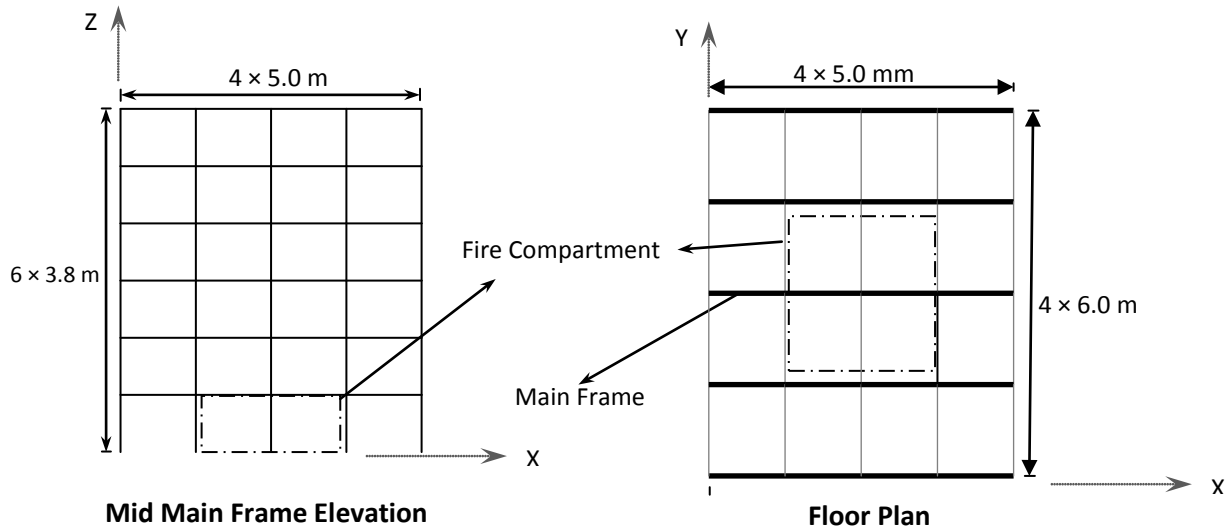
The Elevation and Floor Plan of the 6-Storey Reinforced Concrete Building.
